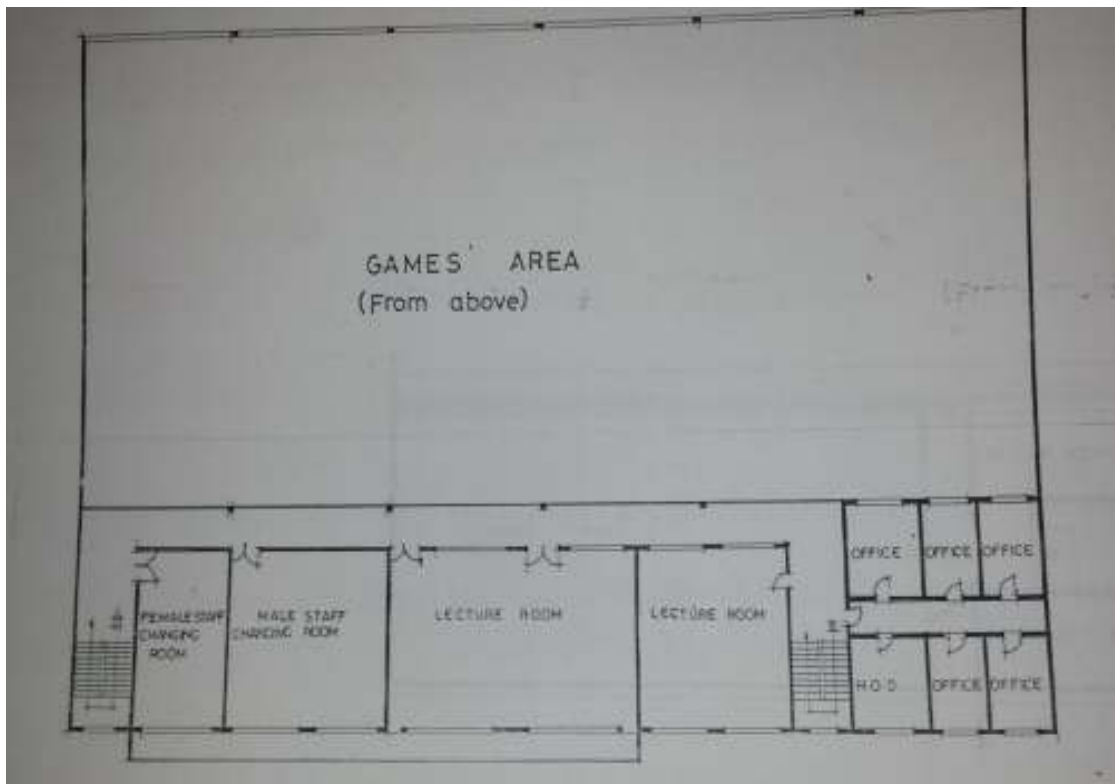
Showing upper floor plan of OAU indoor sports hall.
